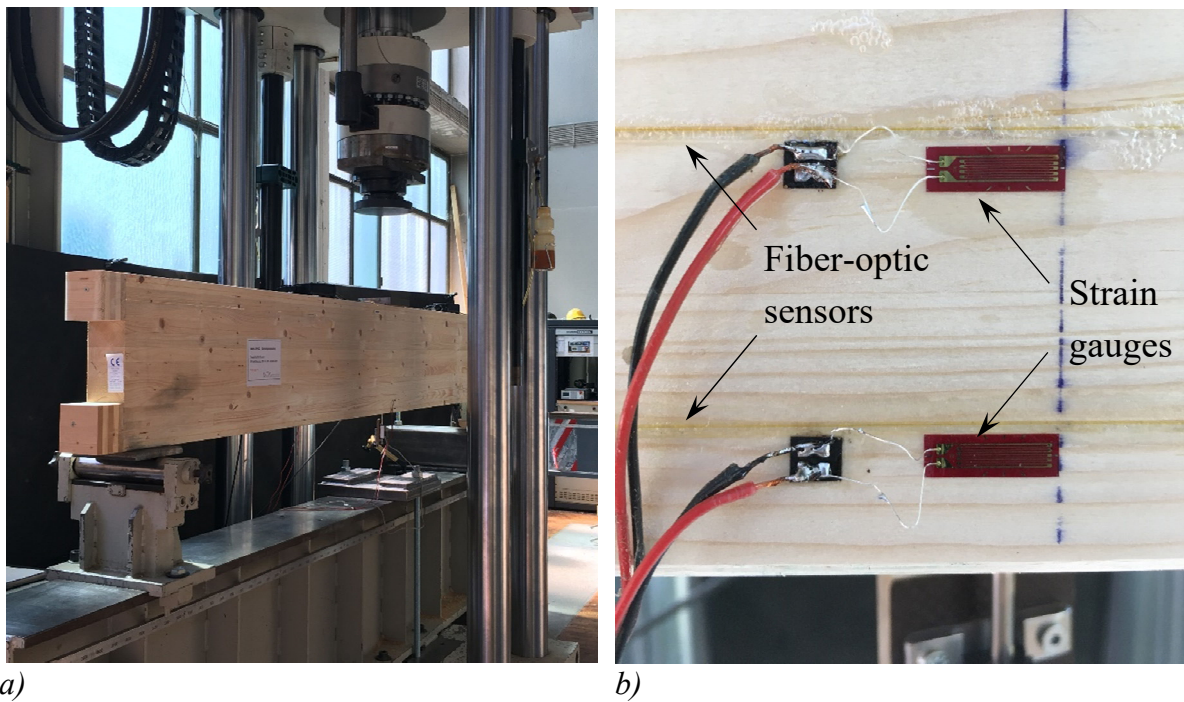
Fotos of the test set-up: (a) Specimen in the testing machine, (b) Detail of the sensors
